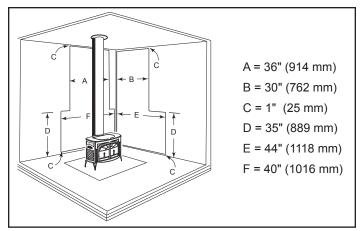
Parallel installation, vertical chimney connector, with stove, connector and wall shields. Maximum reduction for rear and side walls. Wall shields may meet at corner. A heat shield 24" (610mm) in diameter suspended 1" (25mm) below the ceiling must surround the chimney.
